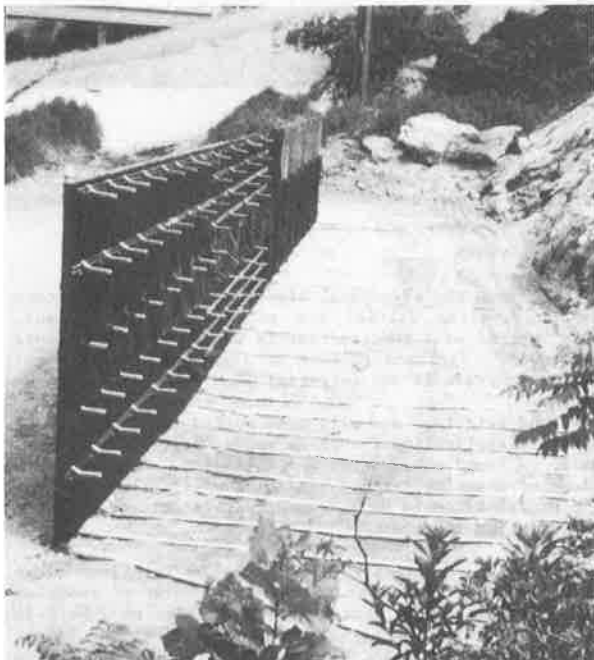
READY TO START BACKFILLING, TEST WALL NO. 3
